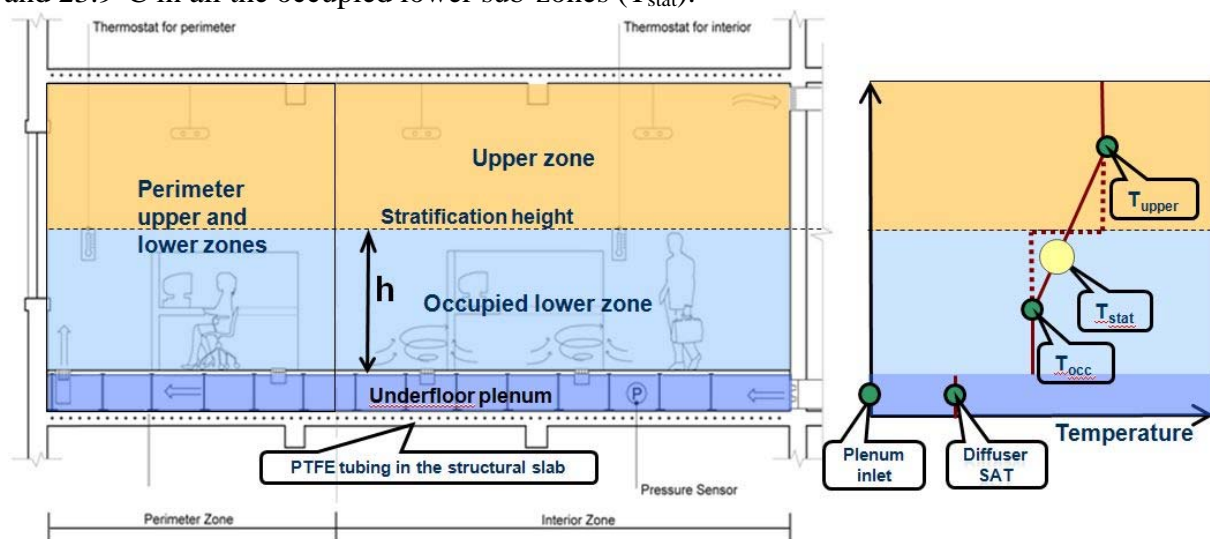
Cross-section of typical interior and perimeter zones on middle floor of building
